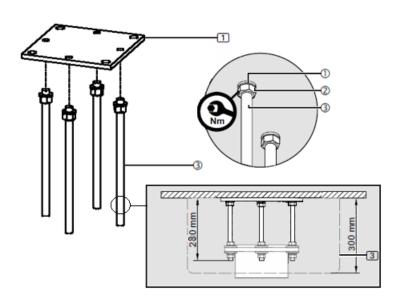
Installation of interface plate without false ceiling for CEILING FIXED ARES
